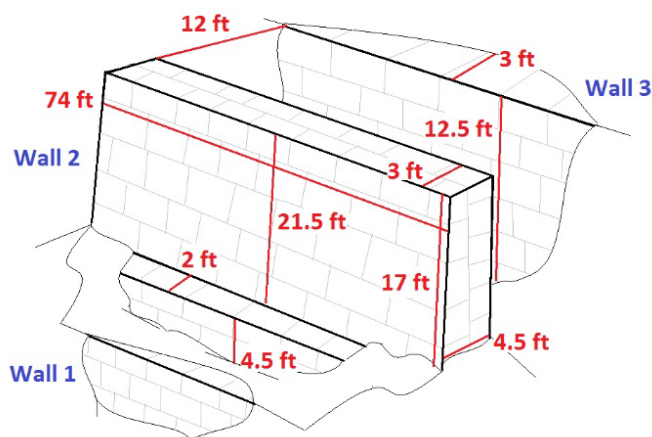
Dimensions and arrangement of the remaining foundation walls.
